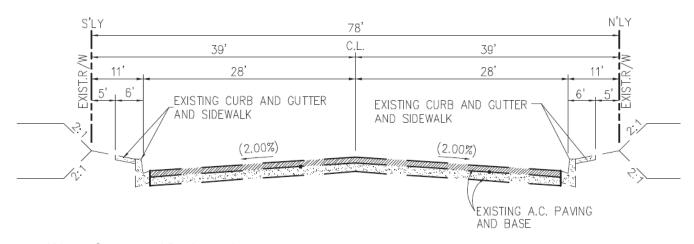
EXISTING STREET SECTIONS TO REMAIN
